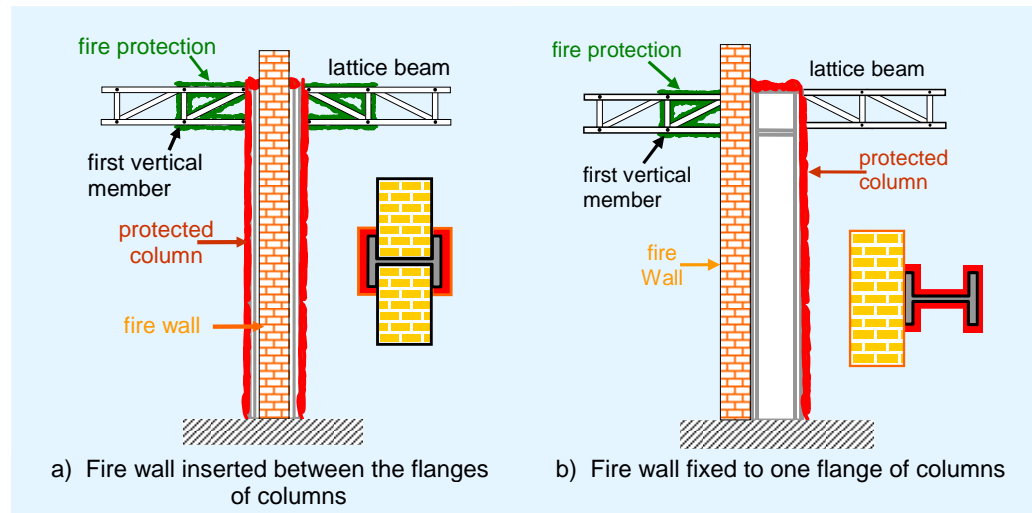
Design detail near fire walls perpendicular to steel frame with lattice beam
